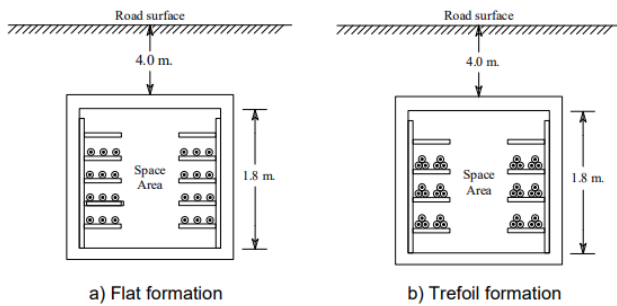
Cable arrangement of square tunnel for the underground power cable installation
